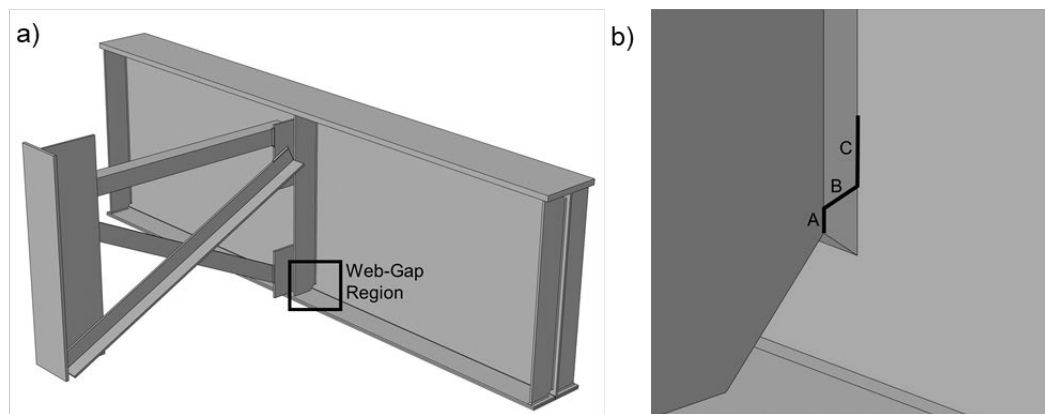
a) Out-of-plane girder subassembly and b) crack location and geometry
